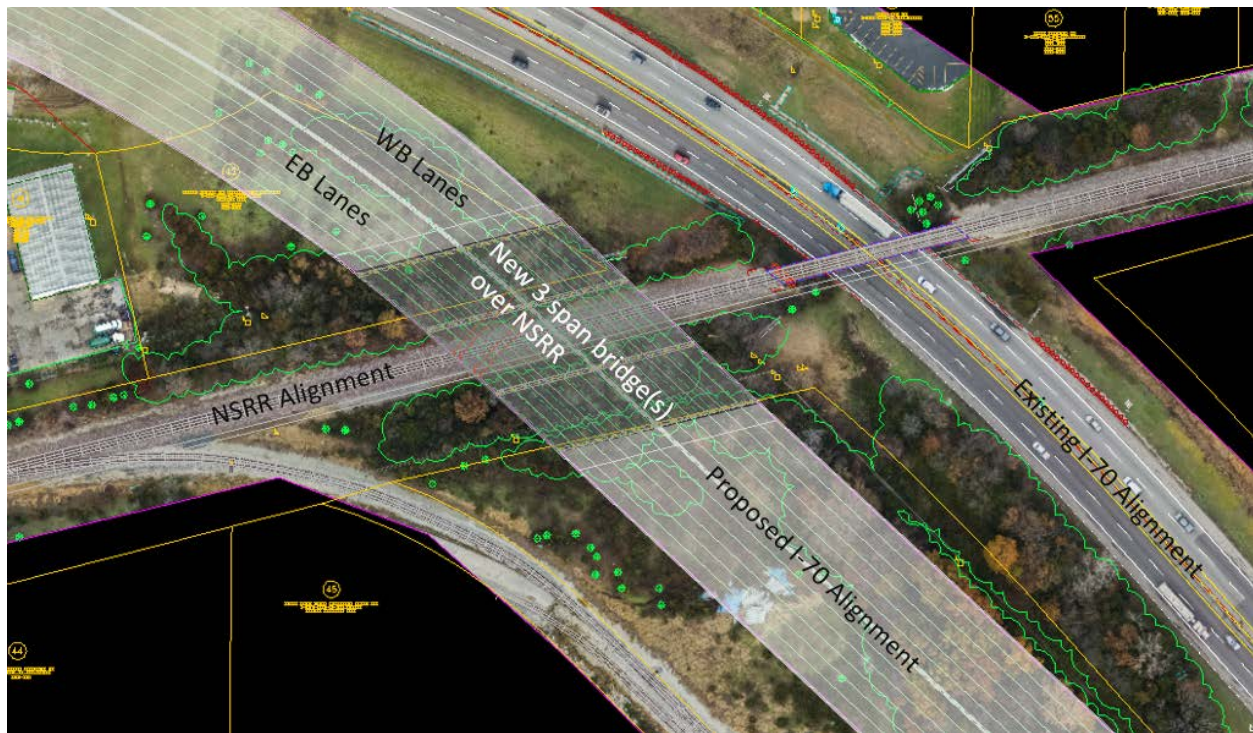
I-70 Mainline (Realigned) Bridges over NSRR
